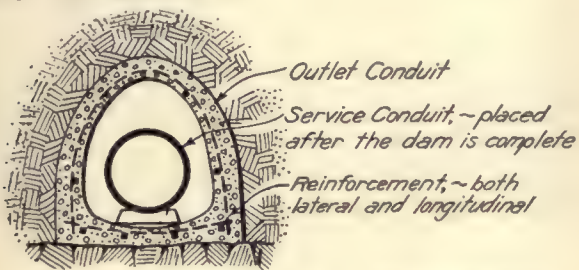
SECTION A-A: SHOWING THE SERVICE CONDUIT LOCATED WITHIN THE OUTLET CONDUIT
